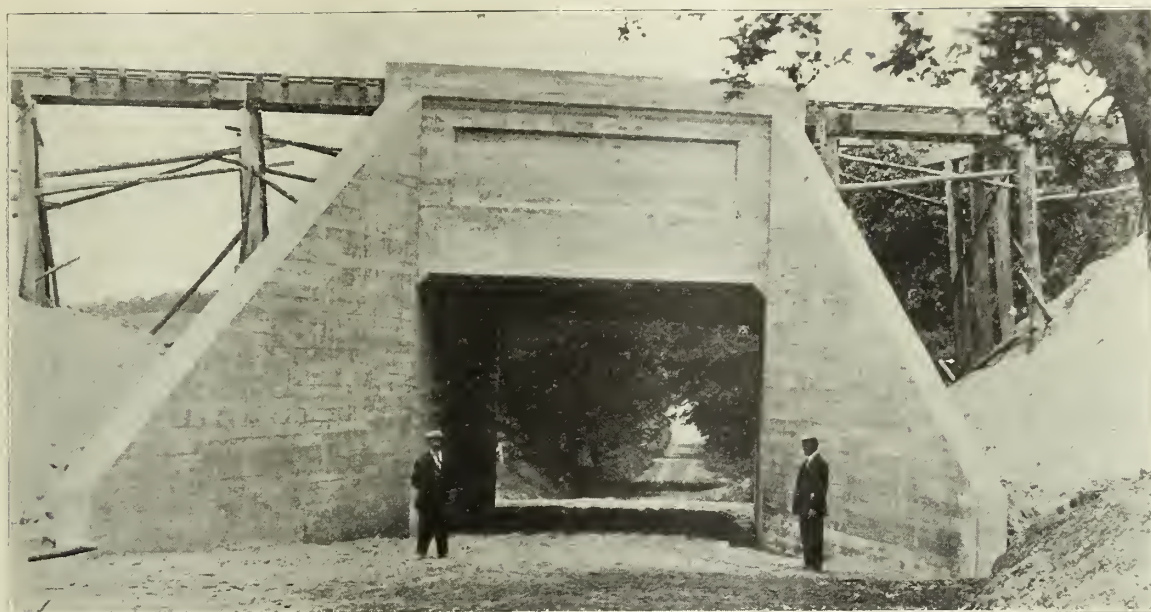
Under Crossing, 20x16 ft., Near Cambridge.
